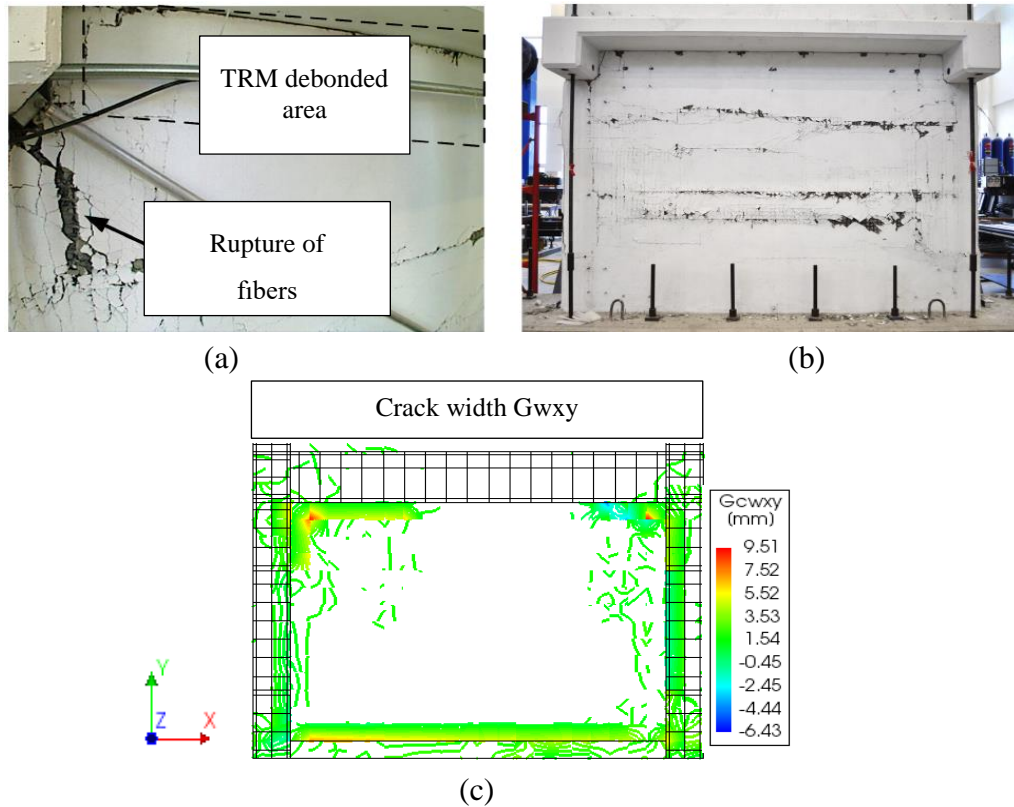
(a) Damage at the first story east-column, and (b) damage at first story of retrofitted infill wall after the end of the experimental test, and (c) crack pattern at the first floor in the retrofitted infilled frame model at the end of the test.
